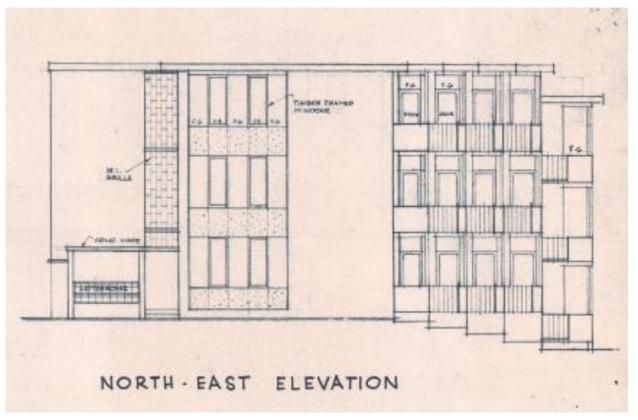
1968 drawing showing the front or north-east elevation (Source: BP)
